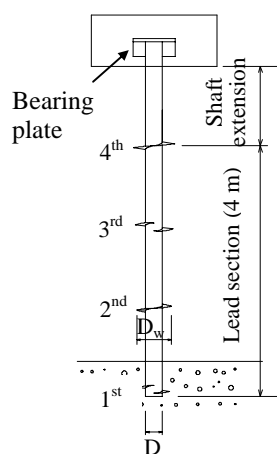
MH-MP configuration PHOTO 1 Piling rig with MH-MP
